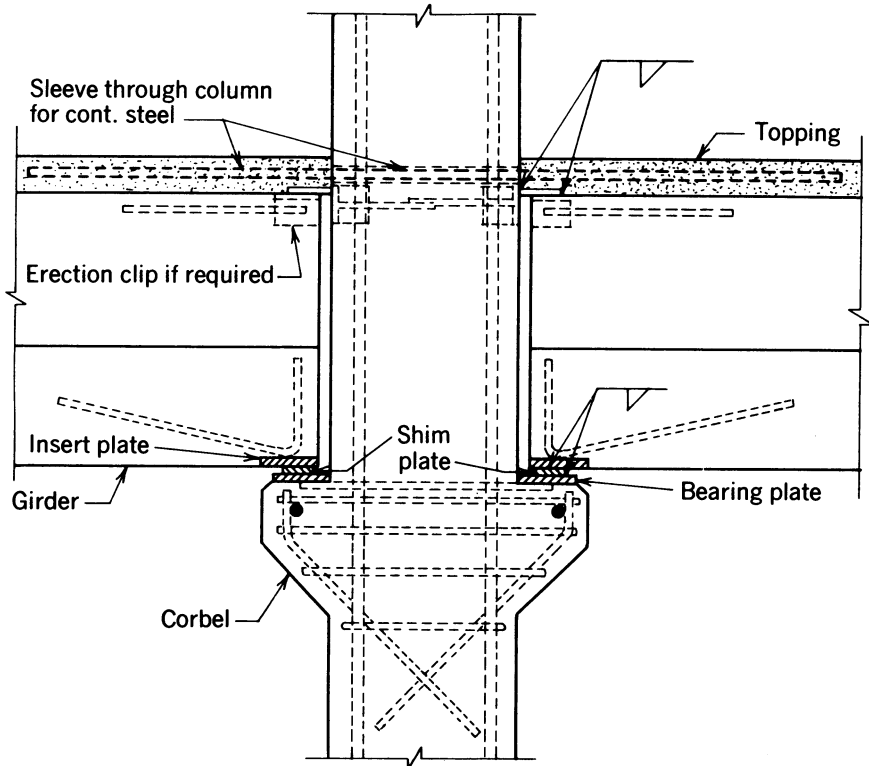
Beam connection detail with welded steel plates at bottom and nonprestressed continuity reinforcement at top.
